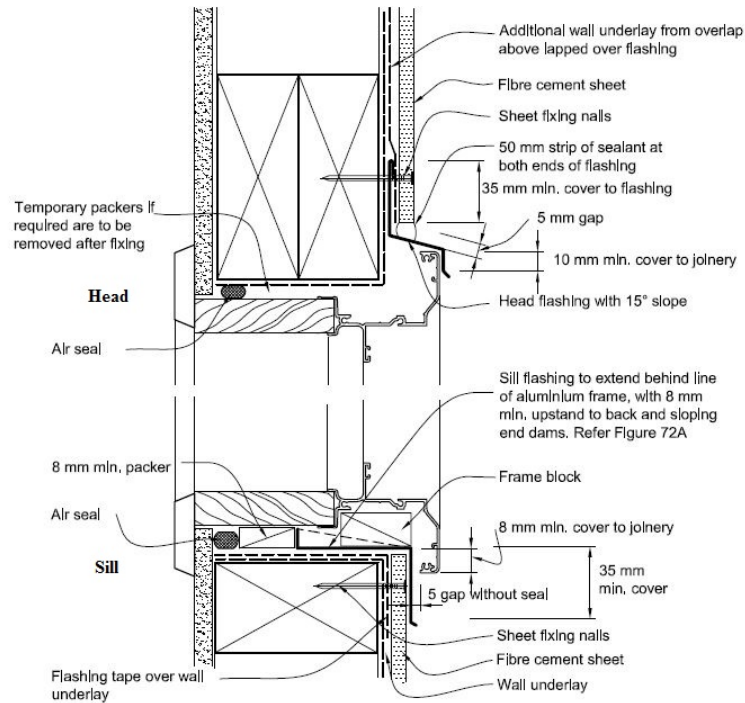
Head and Sill Details from the E2 External Moisture Standard
